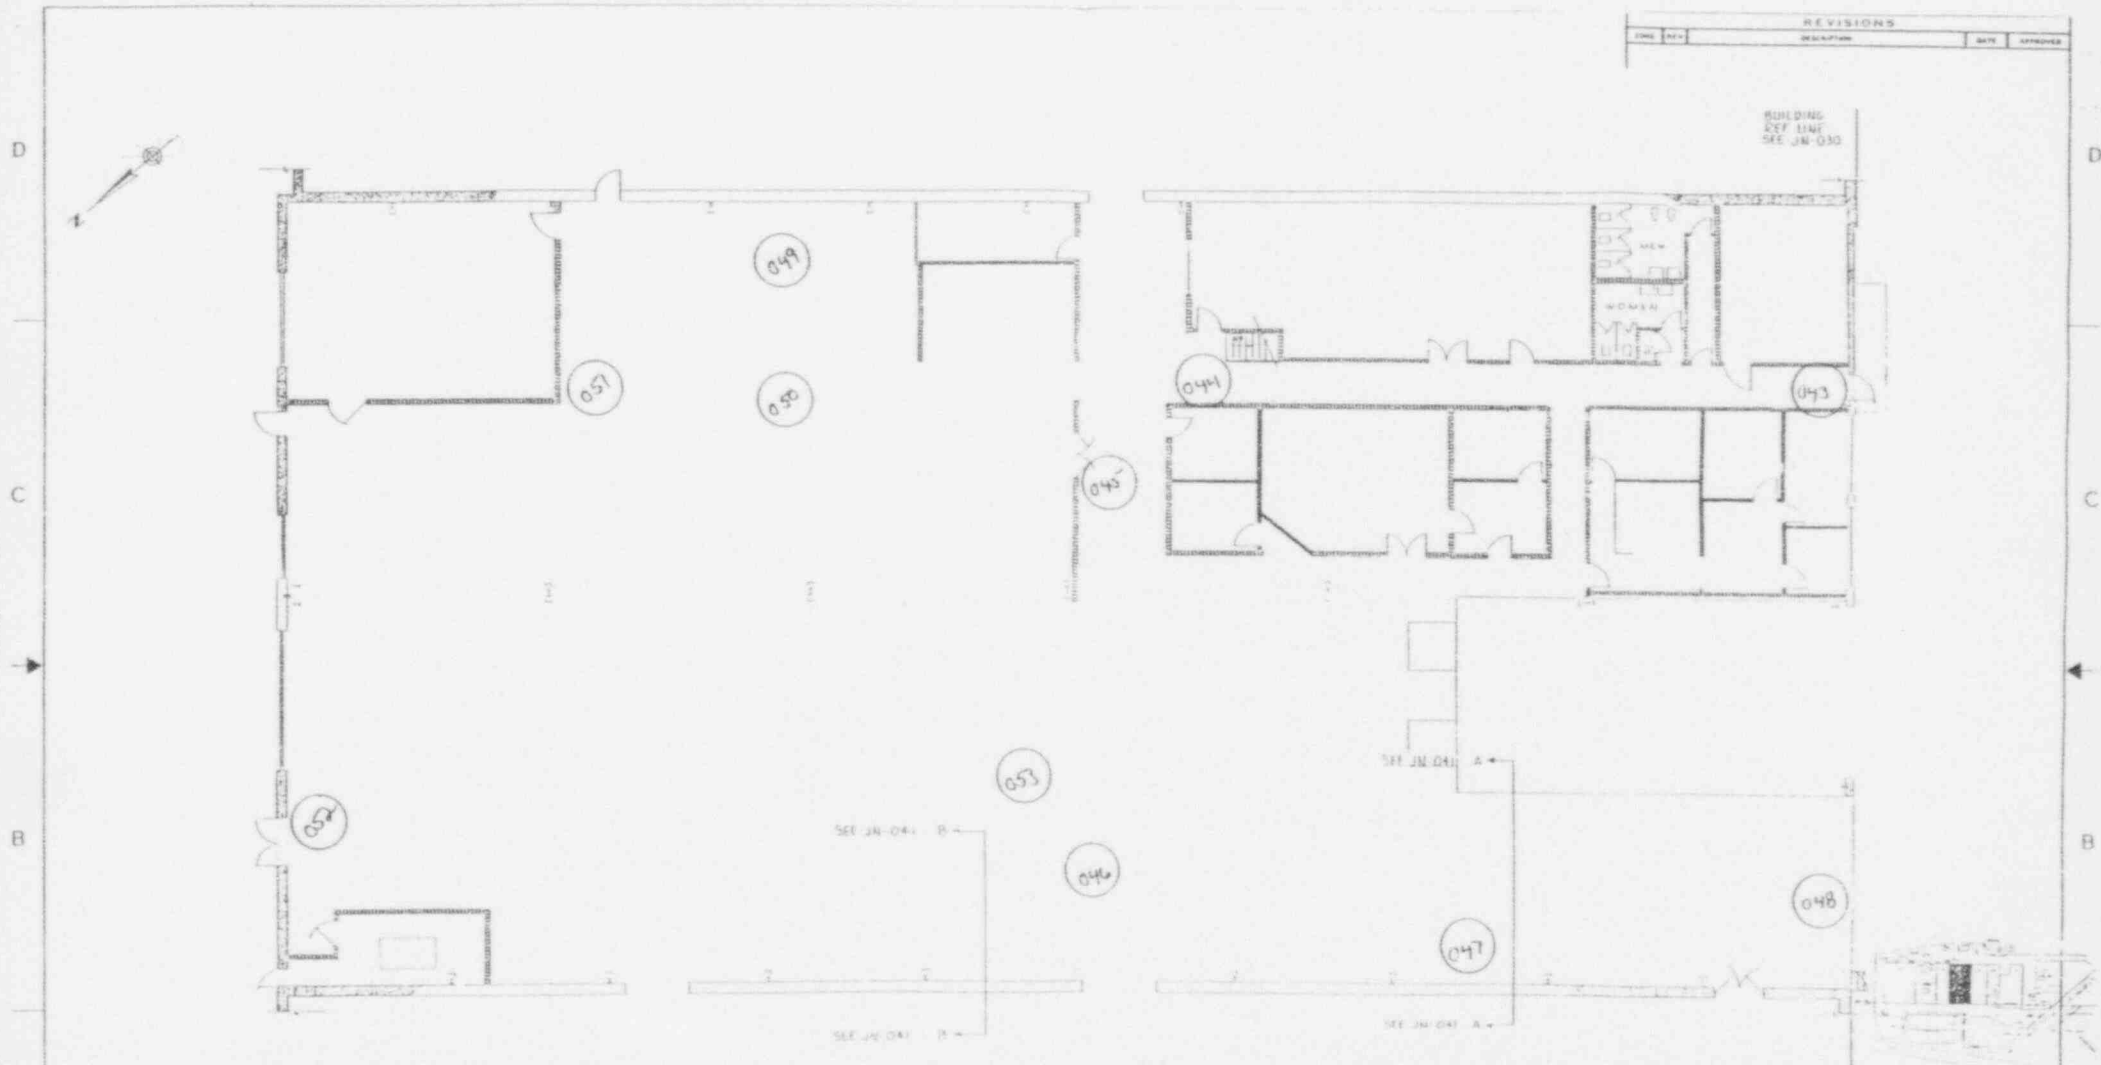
BUILDING 7 - FIRST FLOOR
